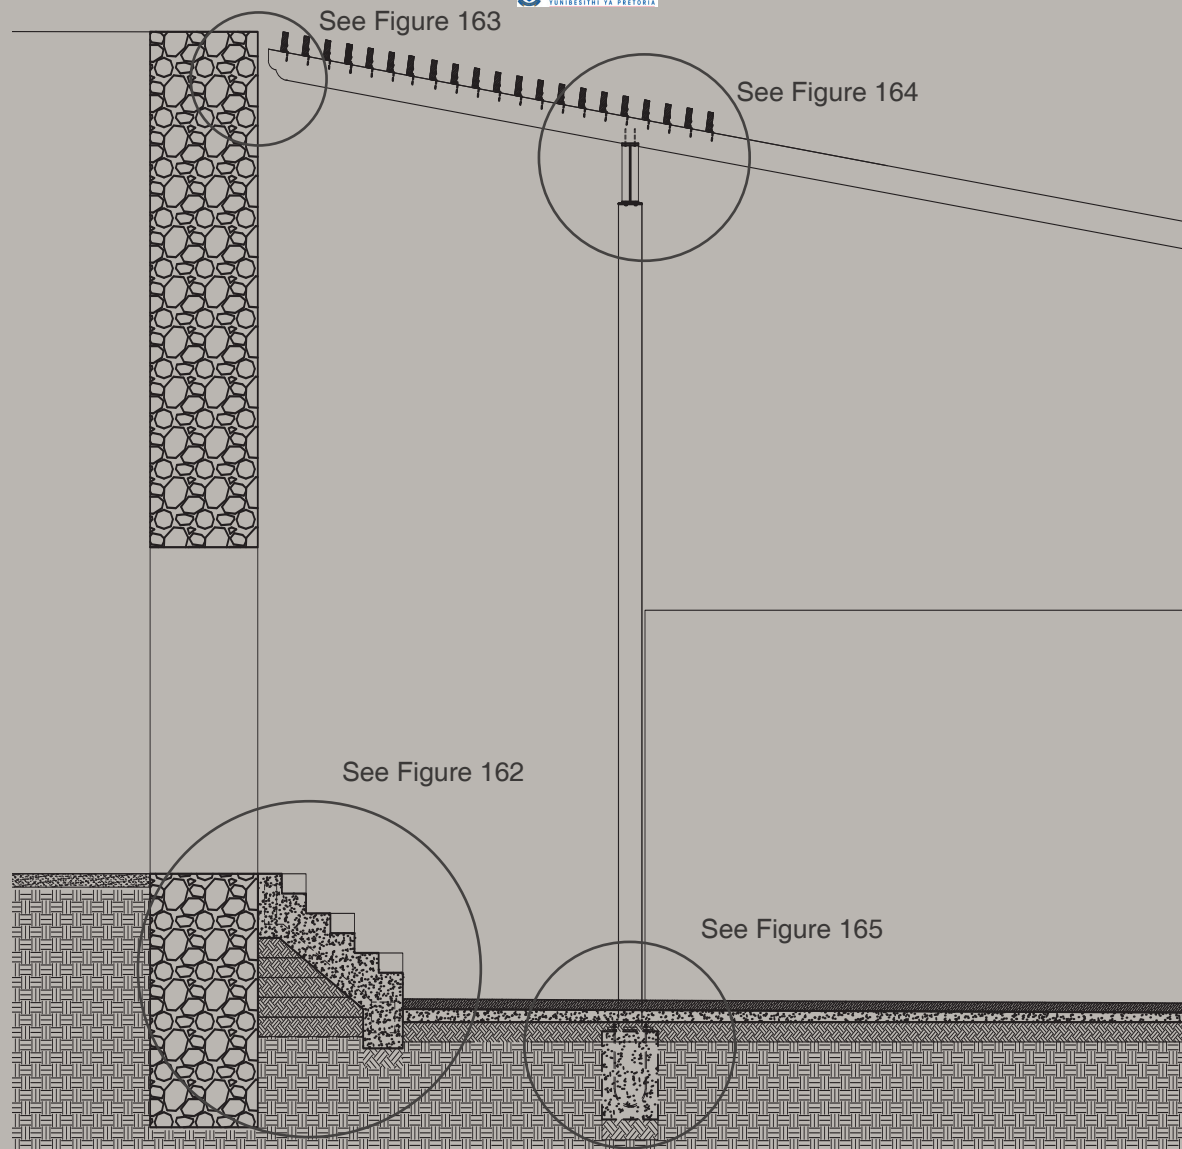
Detail Section Elevation (1:50) of Courtyard (Author, 2014).
